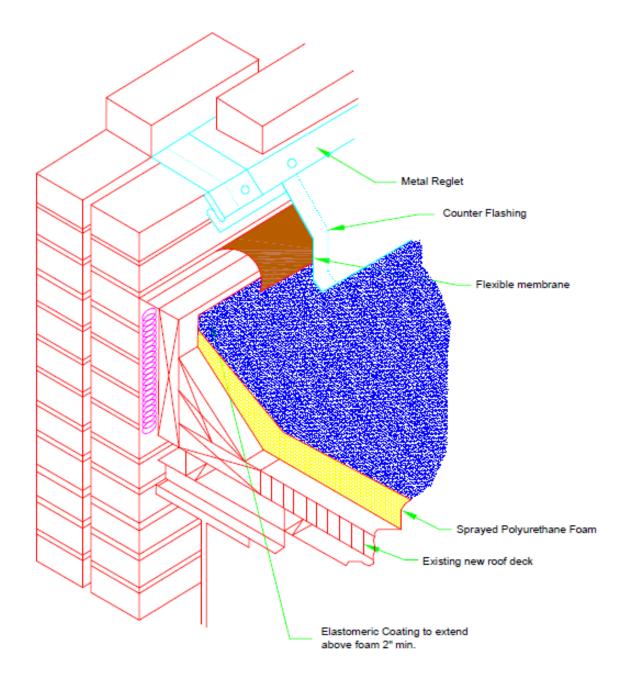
HIGH WALL REMEDIAL THROUGH WALL FLASHING
